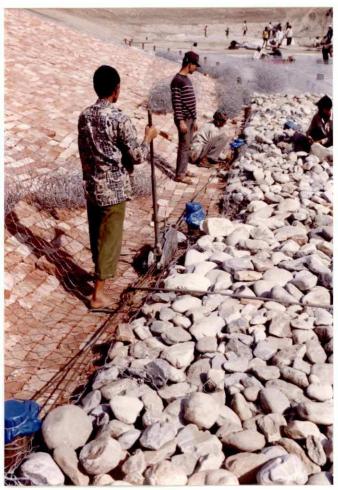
Test Site III – Ghutail; Launching Apron: "pre-stressing" of anchor cables
